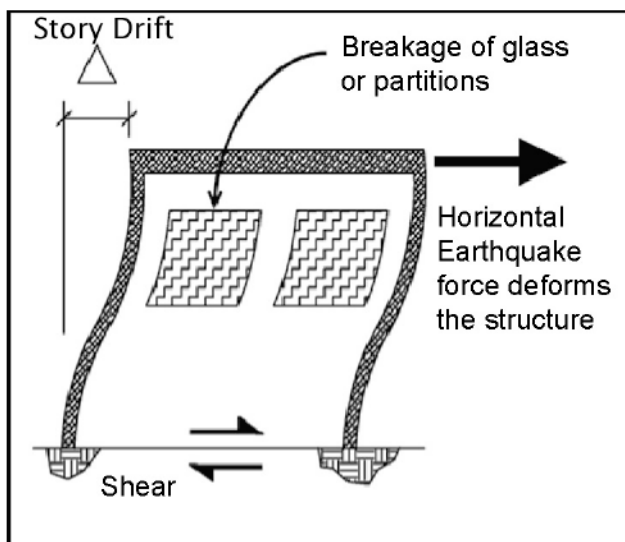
Nonstructural damage due to building deformation (FEMA 74. 2011)
